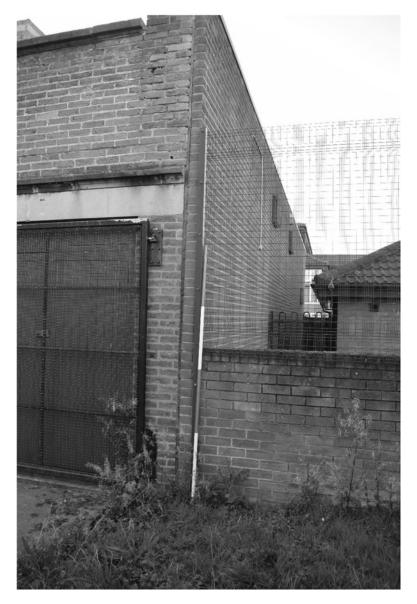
Gymnasium Exterior – North-west Elevation. Facing South.
